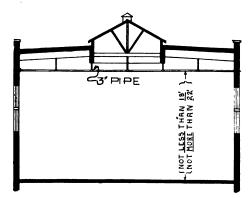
Low Girders. A Condition Common to Many Basement Gymnasia. The above situation is the opposite of that shown in Fig. 10. The apparatus beam plan here shown would be necessary, also in a room having flat concrete or false ceiling without projecting girders.
